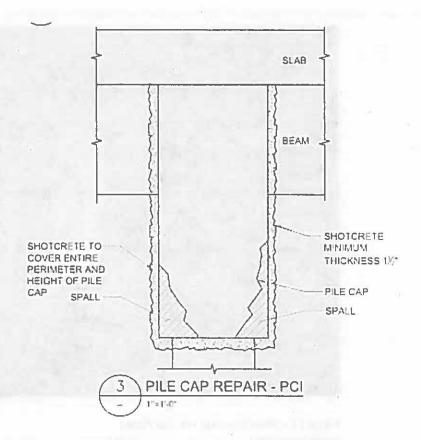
Shotcrete Cap Beam Repair (Alternative not shown, notes as shown below)
